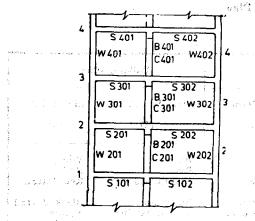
Examples of Designation for Columns, Floors, Walls and Beams
